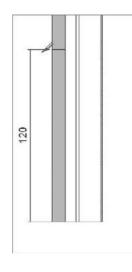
Exterior wall layer built of two different materials arranged vertically.
